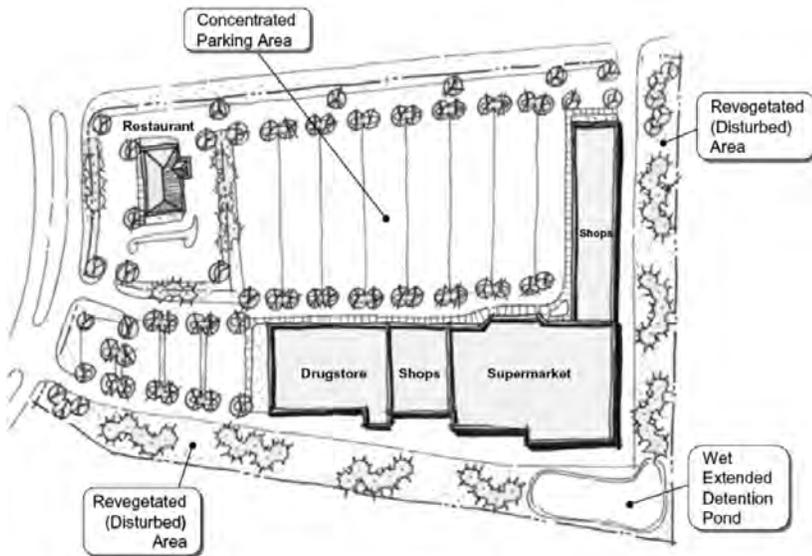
Conventional Parking Lot Layout (RI DEM, 2011)
